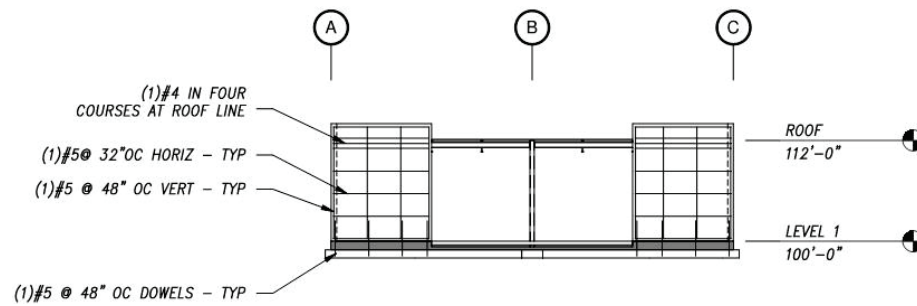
Single-story commercial building East elevation: COM1, COM4, COM7.
